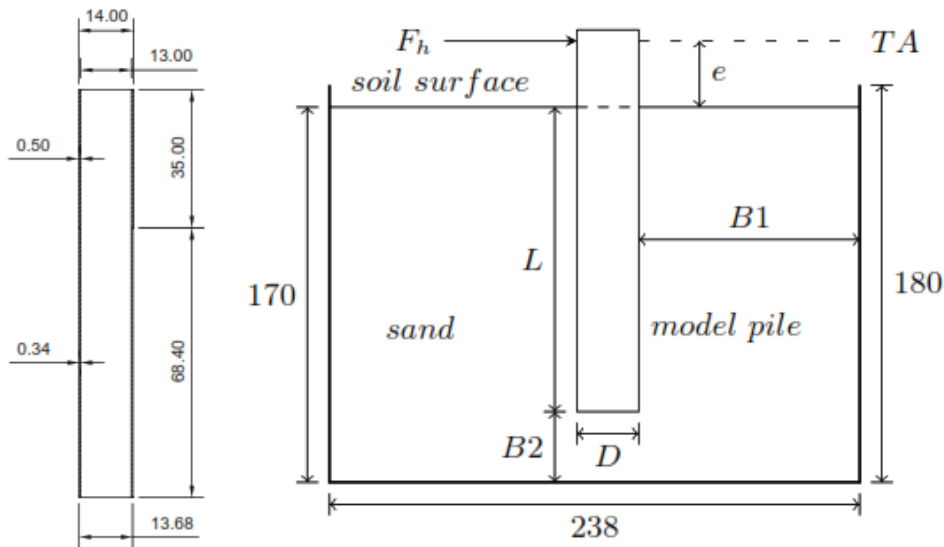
schematic cross-section of the pile and test setup (mm) [20]
